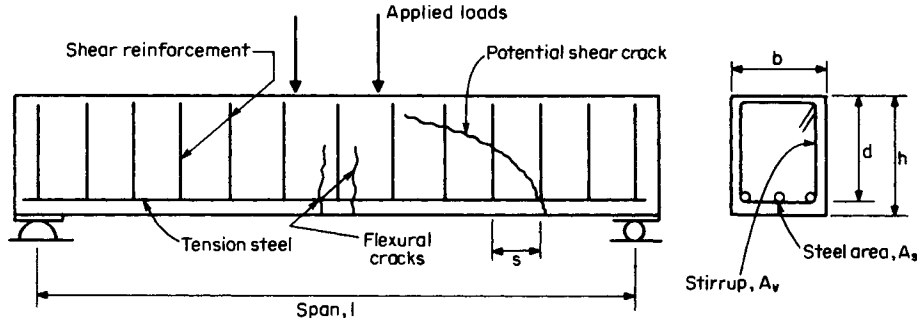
Typical arrangement of reinforcement in beams.
